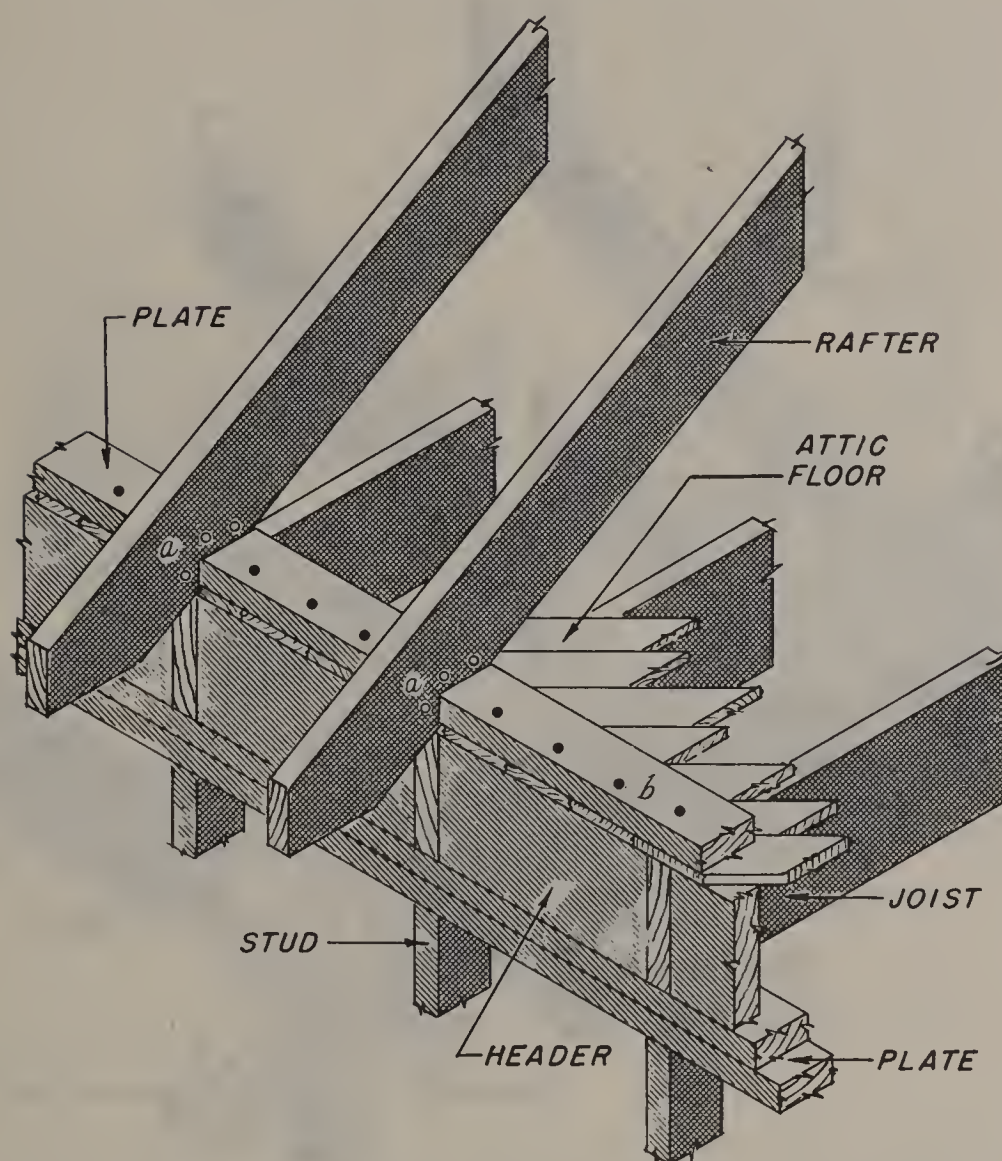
Notched rafters resting on plate. *a*, Rafters toenailed to upper face of plate with two tenpenny nails on each side of rafter and to outer edge of plate with one tenpenny nail on each side. *b*, Plate nailed through attic floor to each joist with one sixteenpenny nail and to headers or header joist with sixteenpenny nails spaced 4 inches on centers. Additional security against uplift of rafters during high winds, if needed, may be attained through the use of metal straps as suggested in figure 49.
